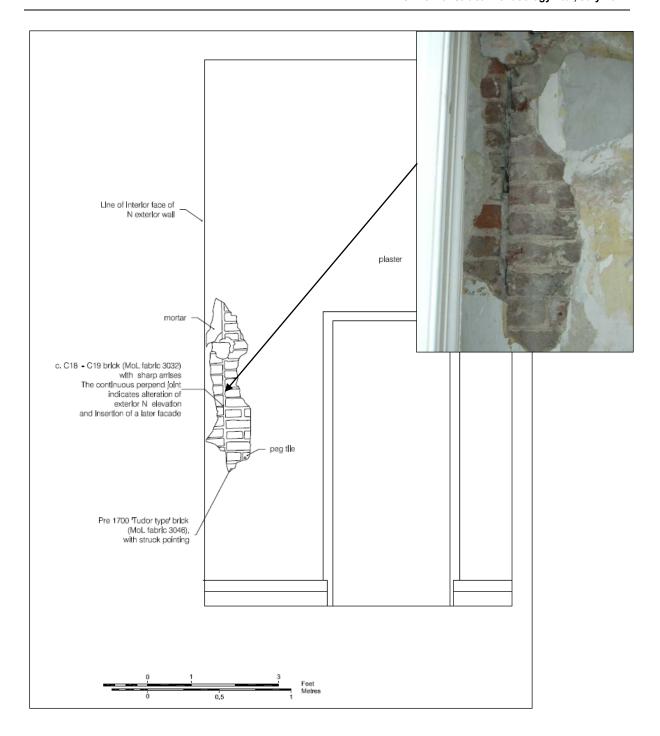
Detail of originally external wall (pre 1764) with struck pointing, and later North Elevation (Room 116 ↑E)
